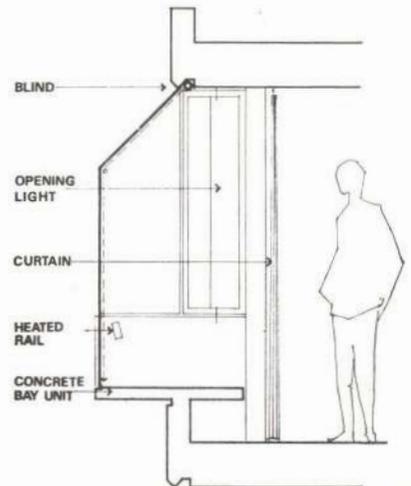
Trinity Hall, Cambridge, Wychfield House.
